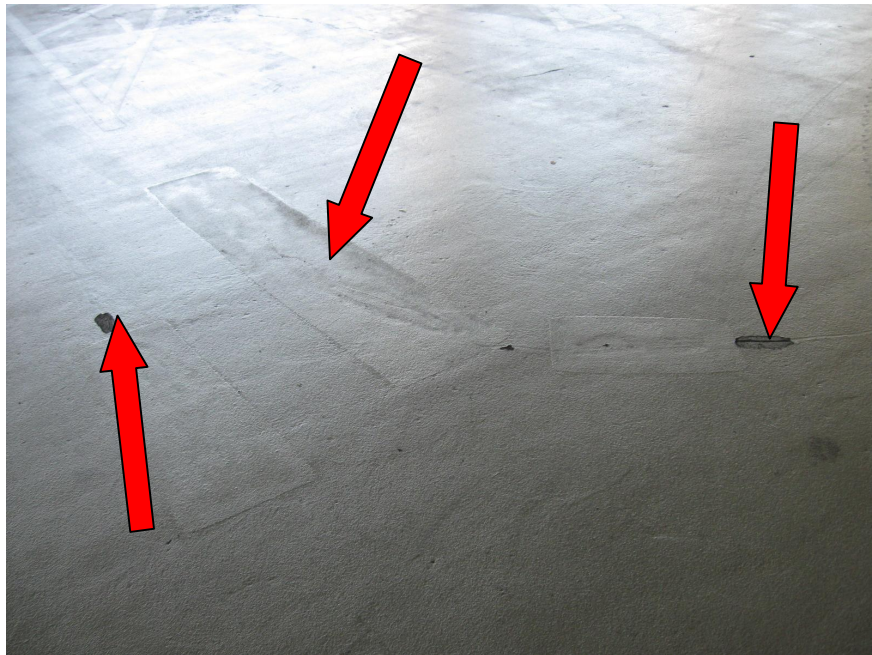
Typical condition of Level 2 waterproofing membrane over occupied space; arrows denote de-bonded membrane
